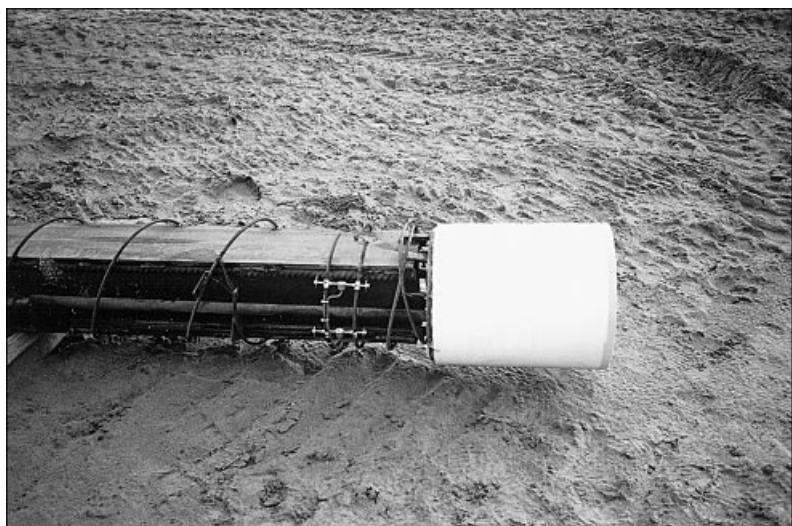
Preliminary test pile reinforcement fitted with strain gauges, inclinometer access tubes and extensometer bars
